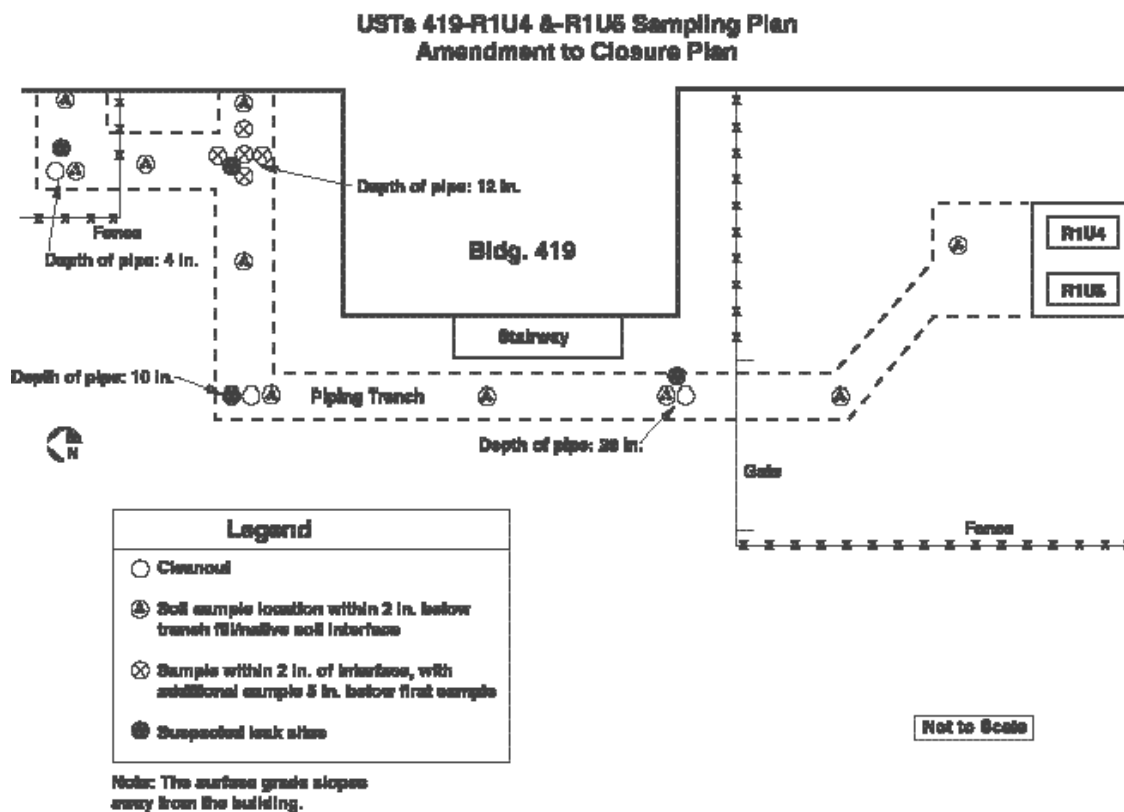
Suspected Leak Sites in the Building 419 UST Piping
